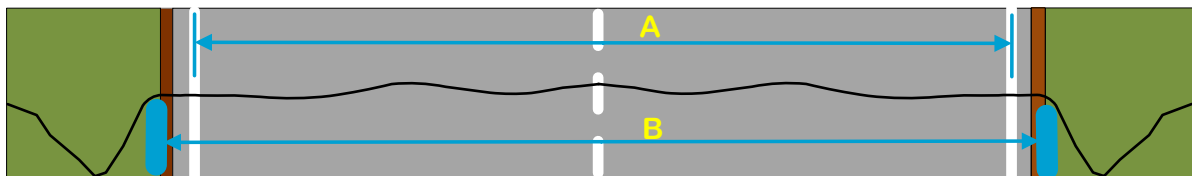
Measuring principles of road (B) and carriageway (A) width calculation.
